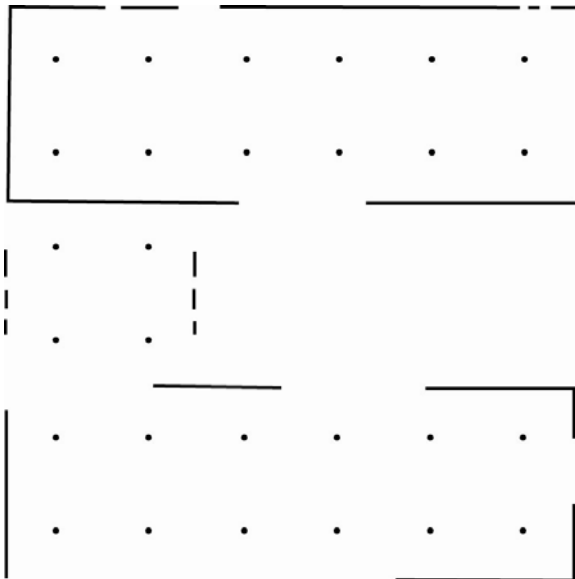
illustrates the building's structural support system: each circle is one roof panel support column, and the heavy lines are the structural walls. Note the short length of the wall on the southern side—the rest of the southern wall is comprised mostly of windows.
